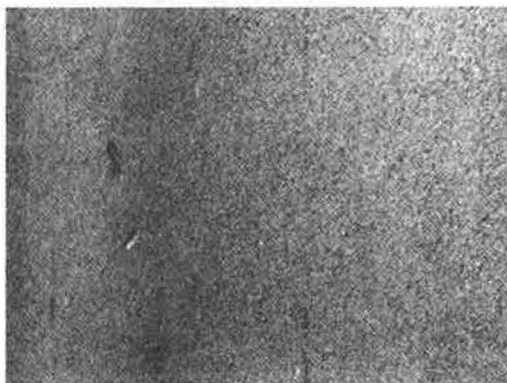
Loss of open-graded material over dense-graded course (southbound, control section).
